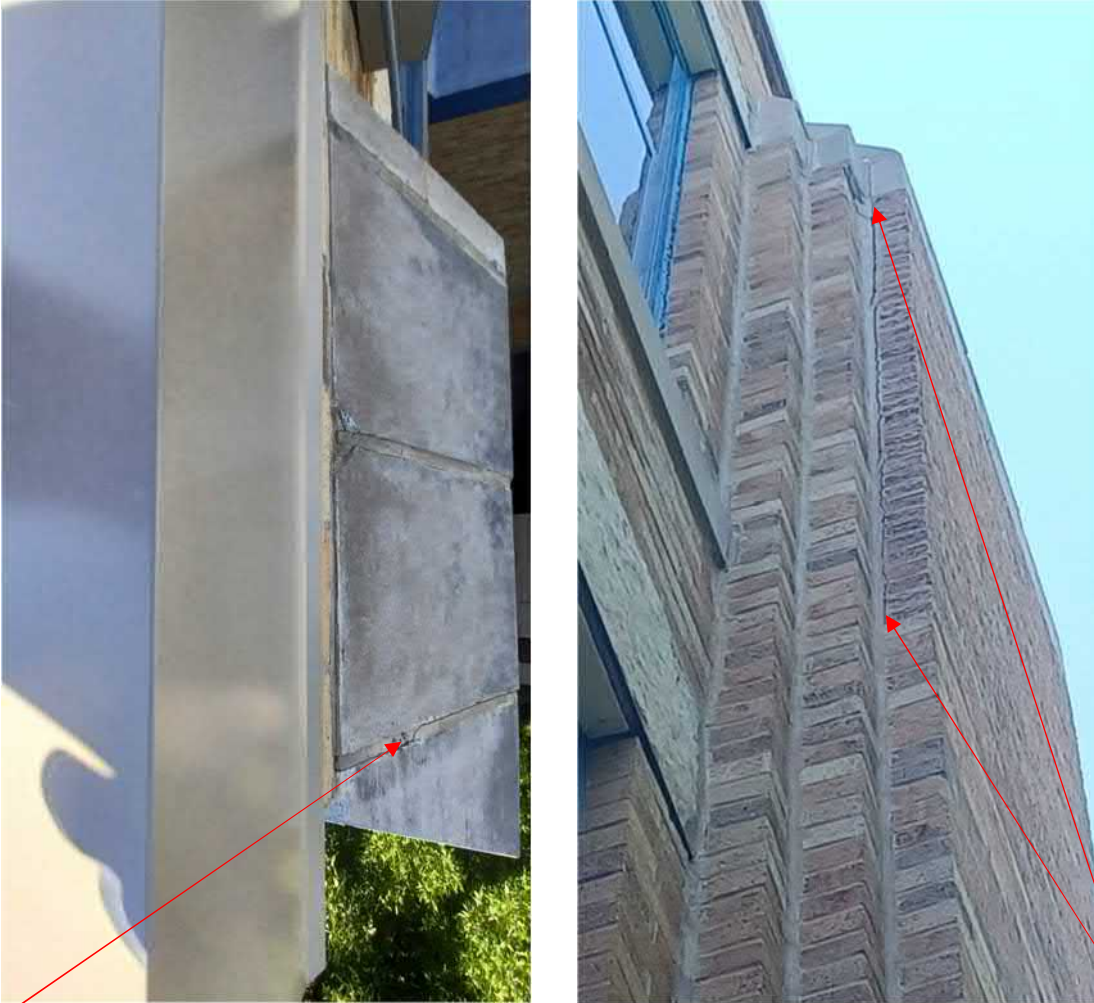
Top, stone cap of brick pier, some cracking of mortar joints, tuckpointing of large crack in joints will be needed. East side of pier, large crack at the top of the pier. Possible separation of bricks, anchor failure etc., more investigation required.
